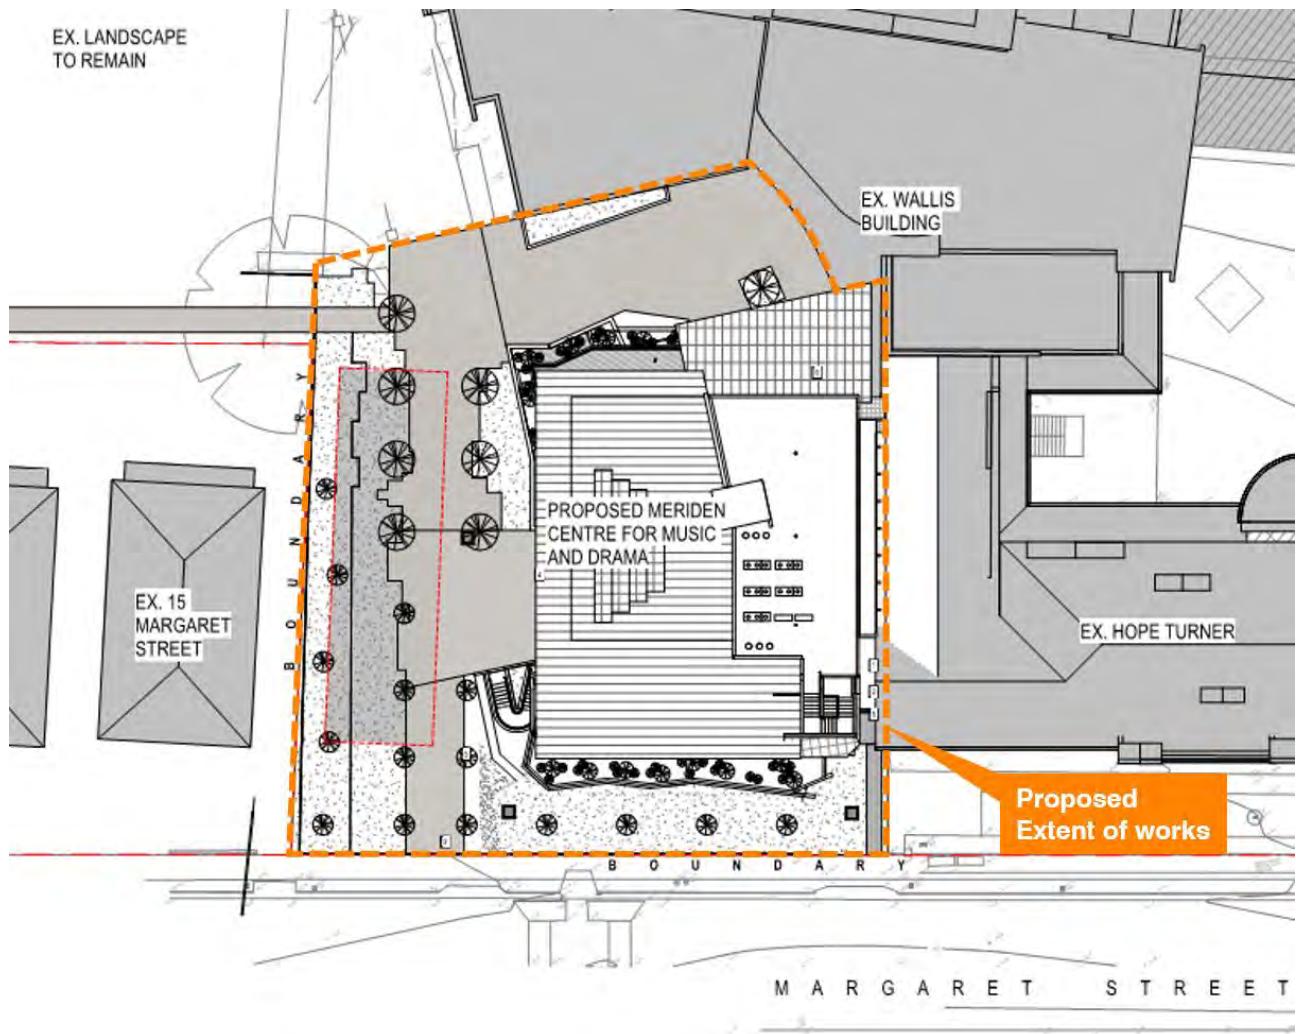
Extent of Proposed Works (Source: Site Plan prepared by Allen Jack and Cottier)
